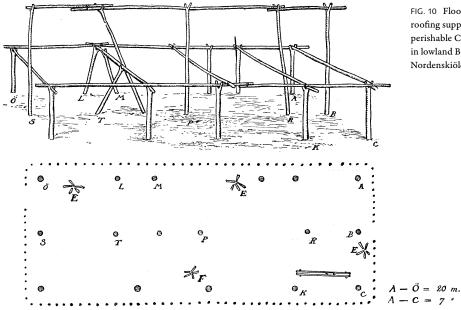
Floorplan and roofing support system of a perishable Chacobo maloca in lowland Bolivia (after Nordenskiöld 1922)
